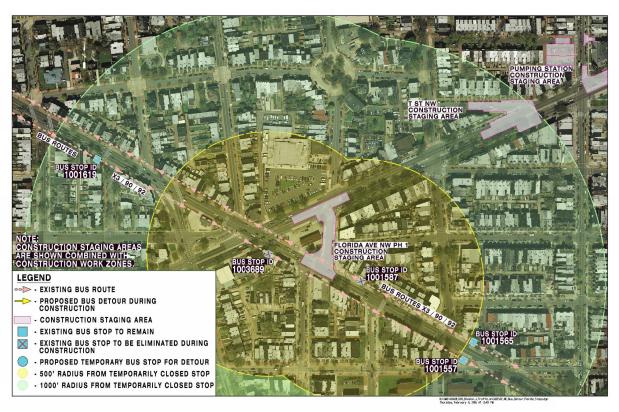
Study Area 3 – Existing Routes X3, 90, 92 and Proximity Map to Temporarily Closed Stops (Florida Avenue Site)
